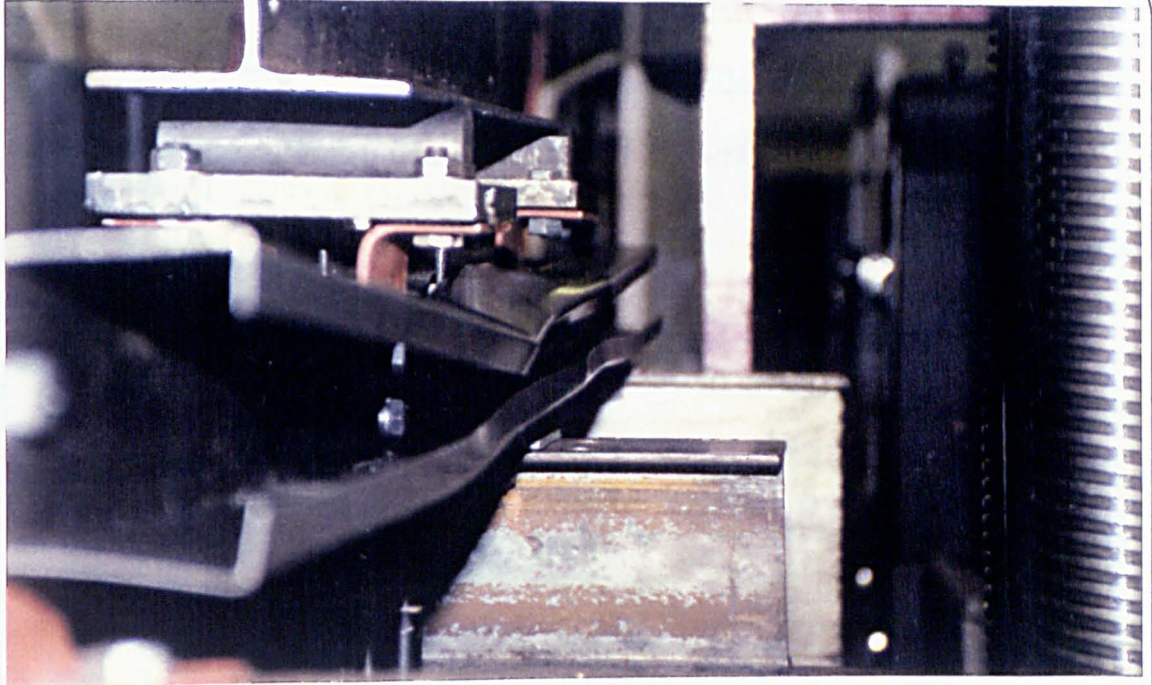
Failure mode in Lipped Channel Double Span Beams
